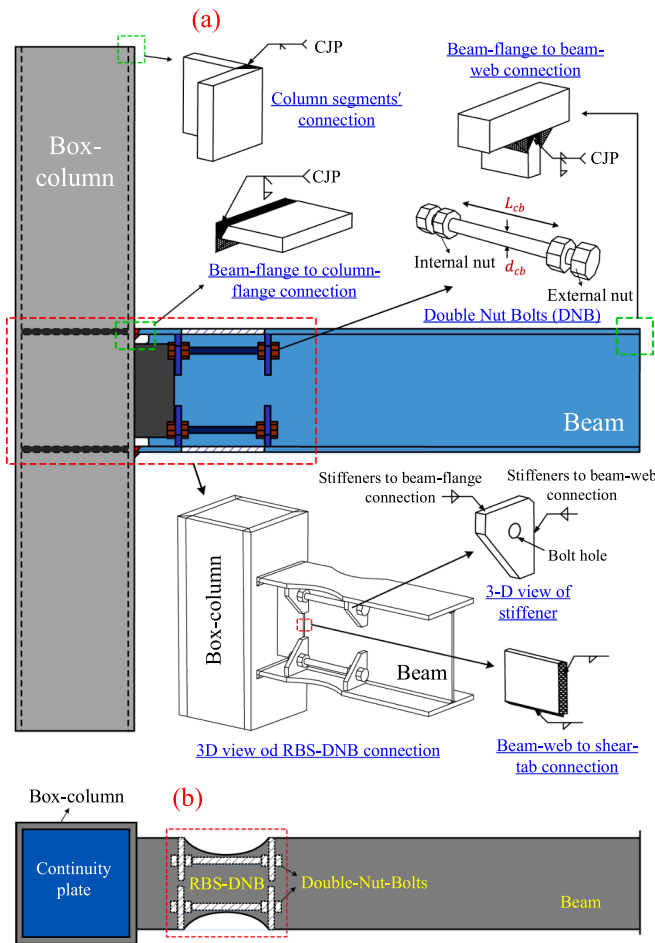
Proposed RBS-DNB moment connection system: (a) fabrication details and connection components, and (b) top view of the RBS-DNB connection.
